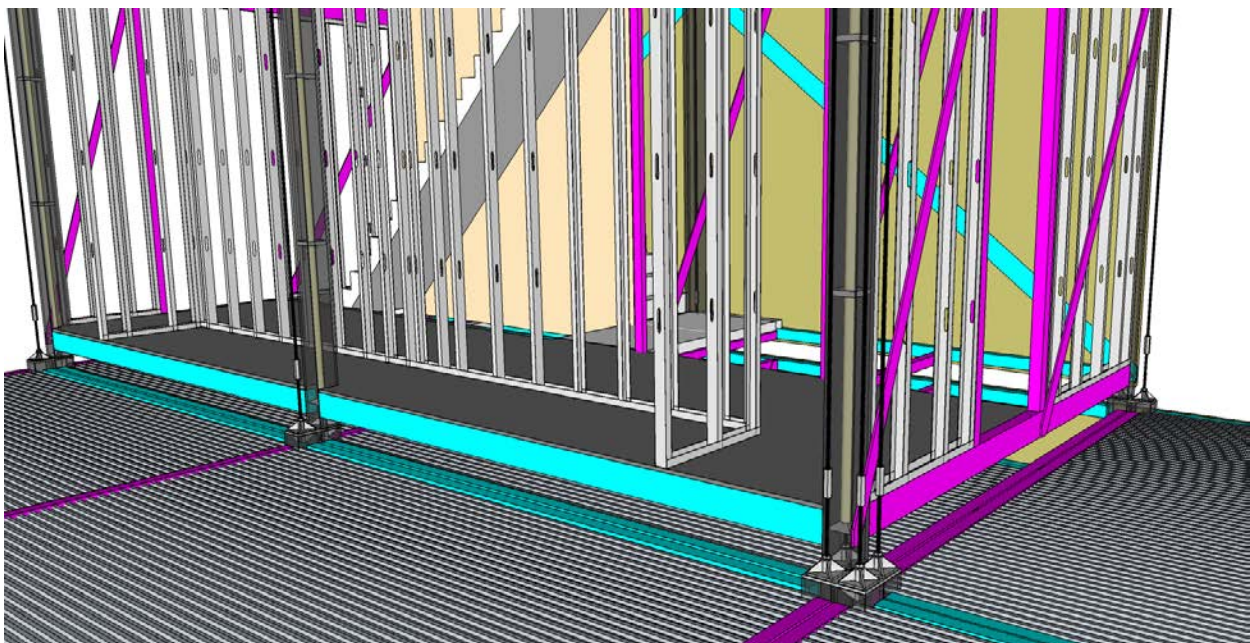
Second floor Module #2.1 is resting in its final place
